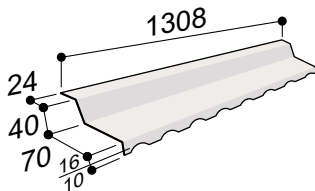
Milano ridge flashing A installed along each side of the ridge
